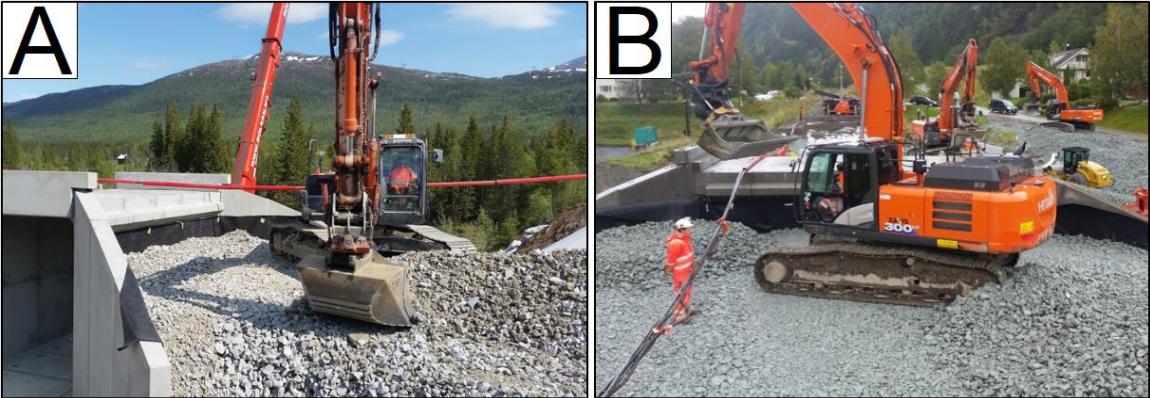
Backfilling with 20/120 crushed rock at two culverts in Norway, showing A) Svenningdal culvert built in 2016 and B) Kilnes culvert built in 2018 (FOTO: Farbu & Gausen AS)
